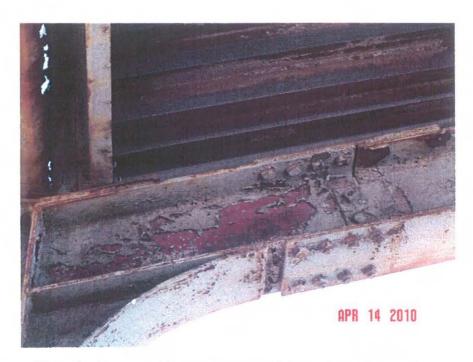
Loose and flaking lead containing paint on beam of railroad depot.
